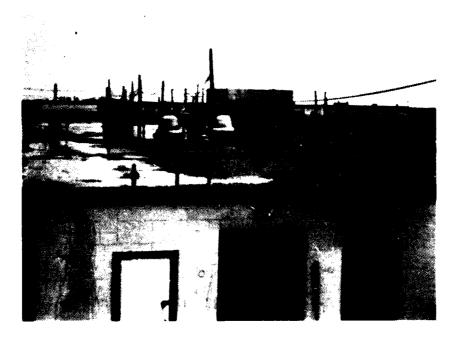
Overview of old BUR on Galley, Naval Facility, Cape Hatteras, N.C.
